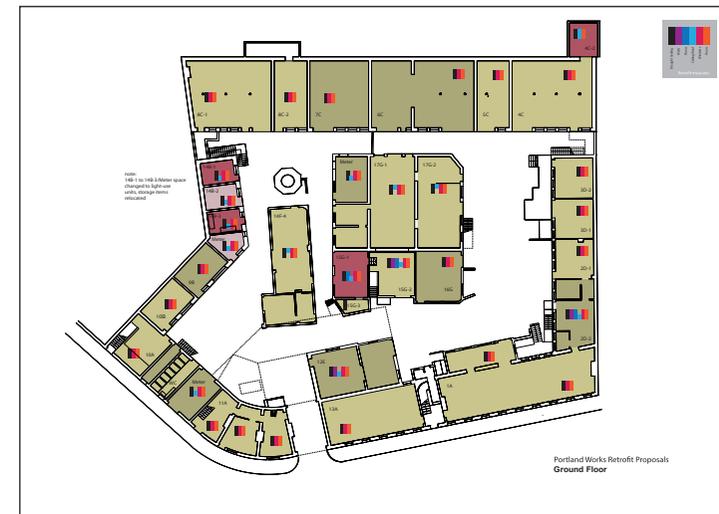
Ground floor plan showing existing occupation and proposed retrofit measures
